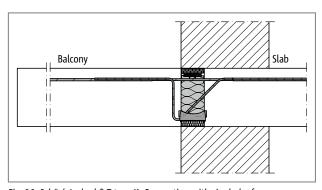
Schöck Isokorb® T type K: Connection with single-leaf masonry
